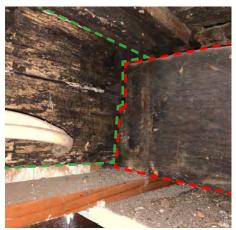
Kitchen ceiling removed above bake oven showing joint of west chimney girt (red) to the east/west girt above the fireplace wall (green). Whitewash on the latter suggests it was originally exposed to view
